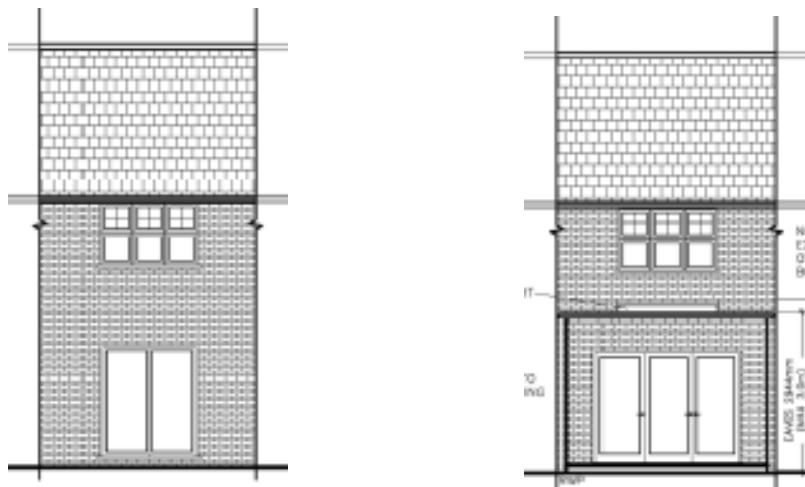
Existing rear elevation (Left) and proposed rear elevation (Right)
